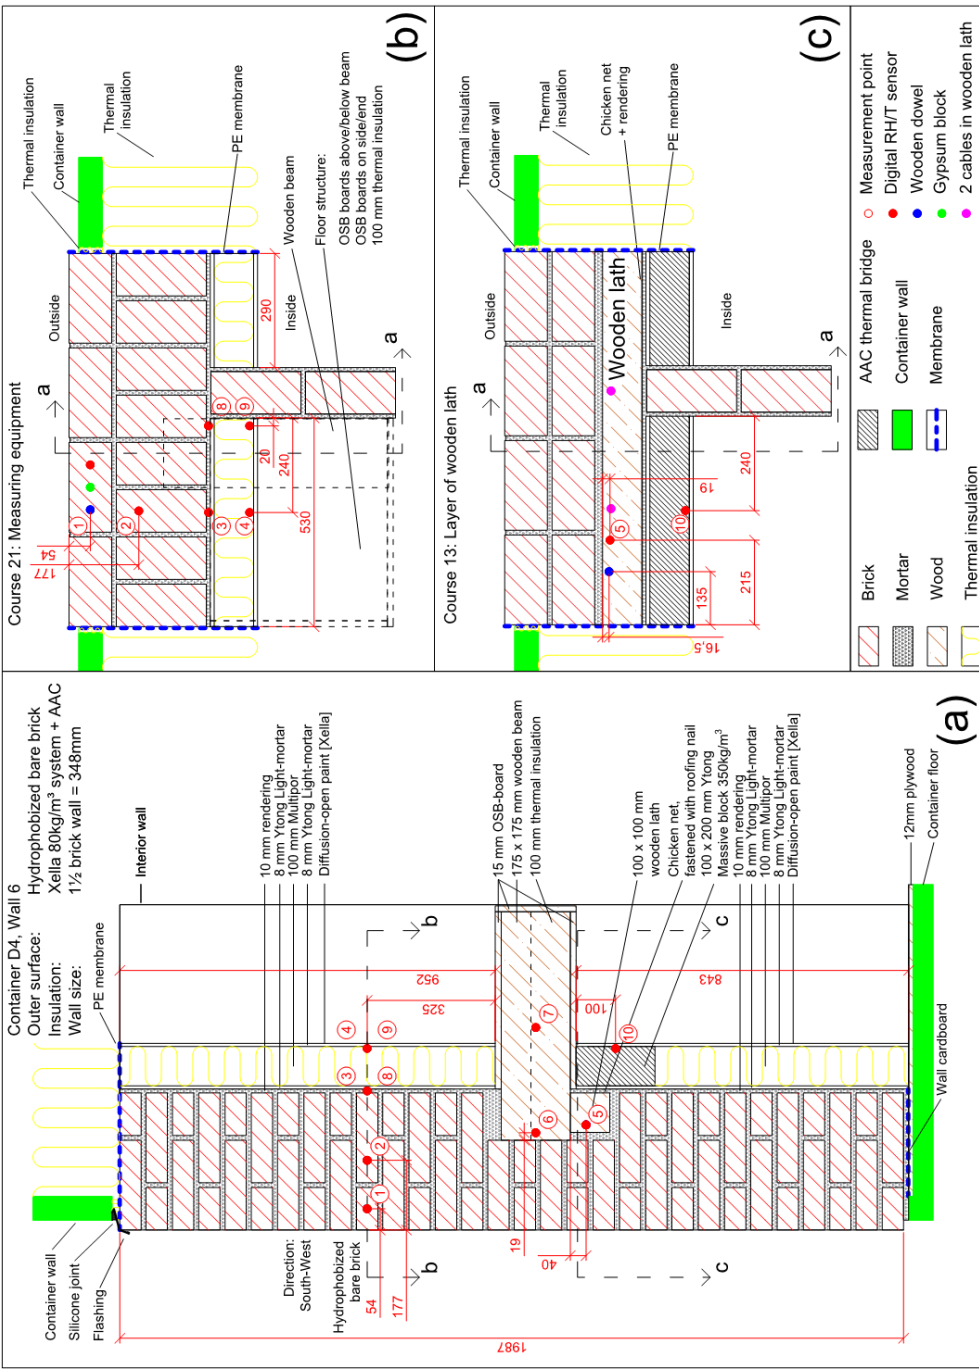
Illustration of the wall compositions and placement of measurements. (a) show a vertical cut in the wooden beam of Wall 6, (b) & (c) show courses with measuring equipment.
